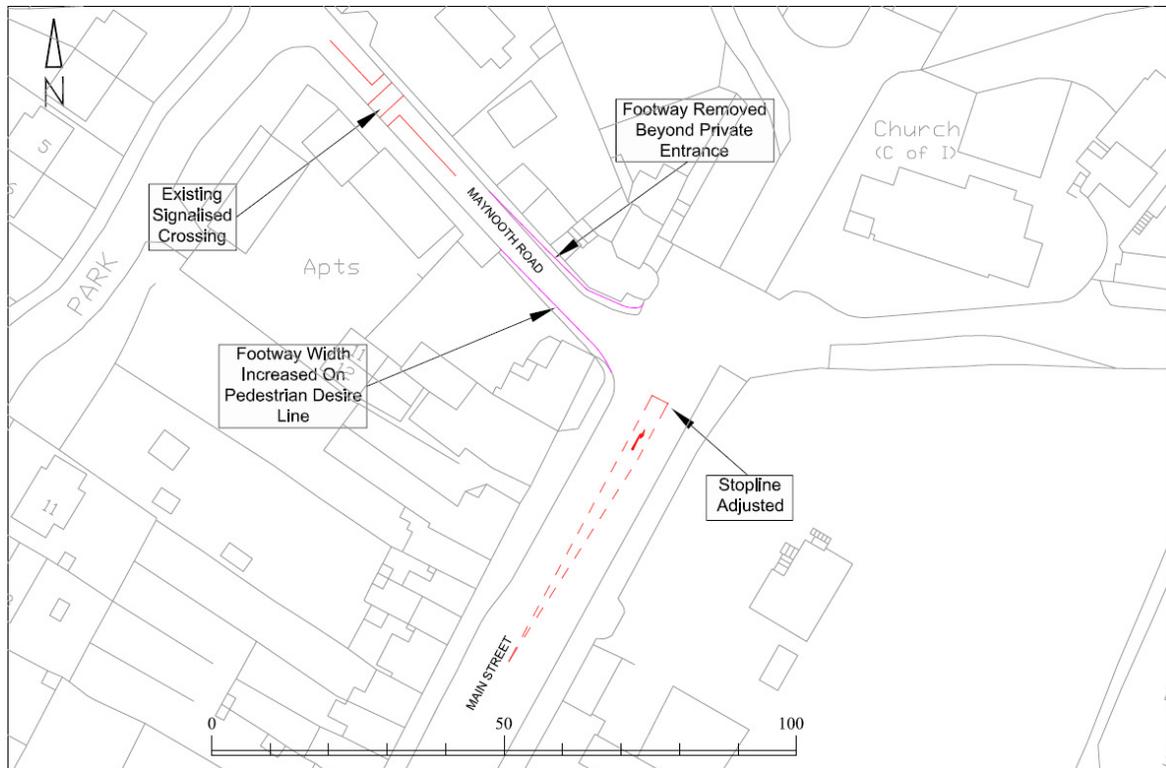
Proposed junction improvement: Castletown Gates, Celbridge
